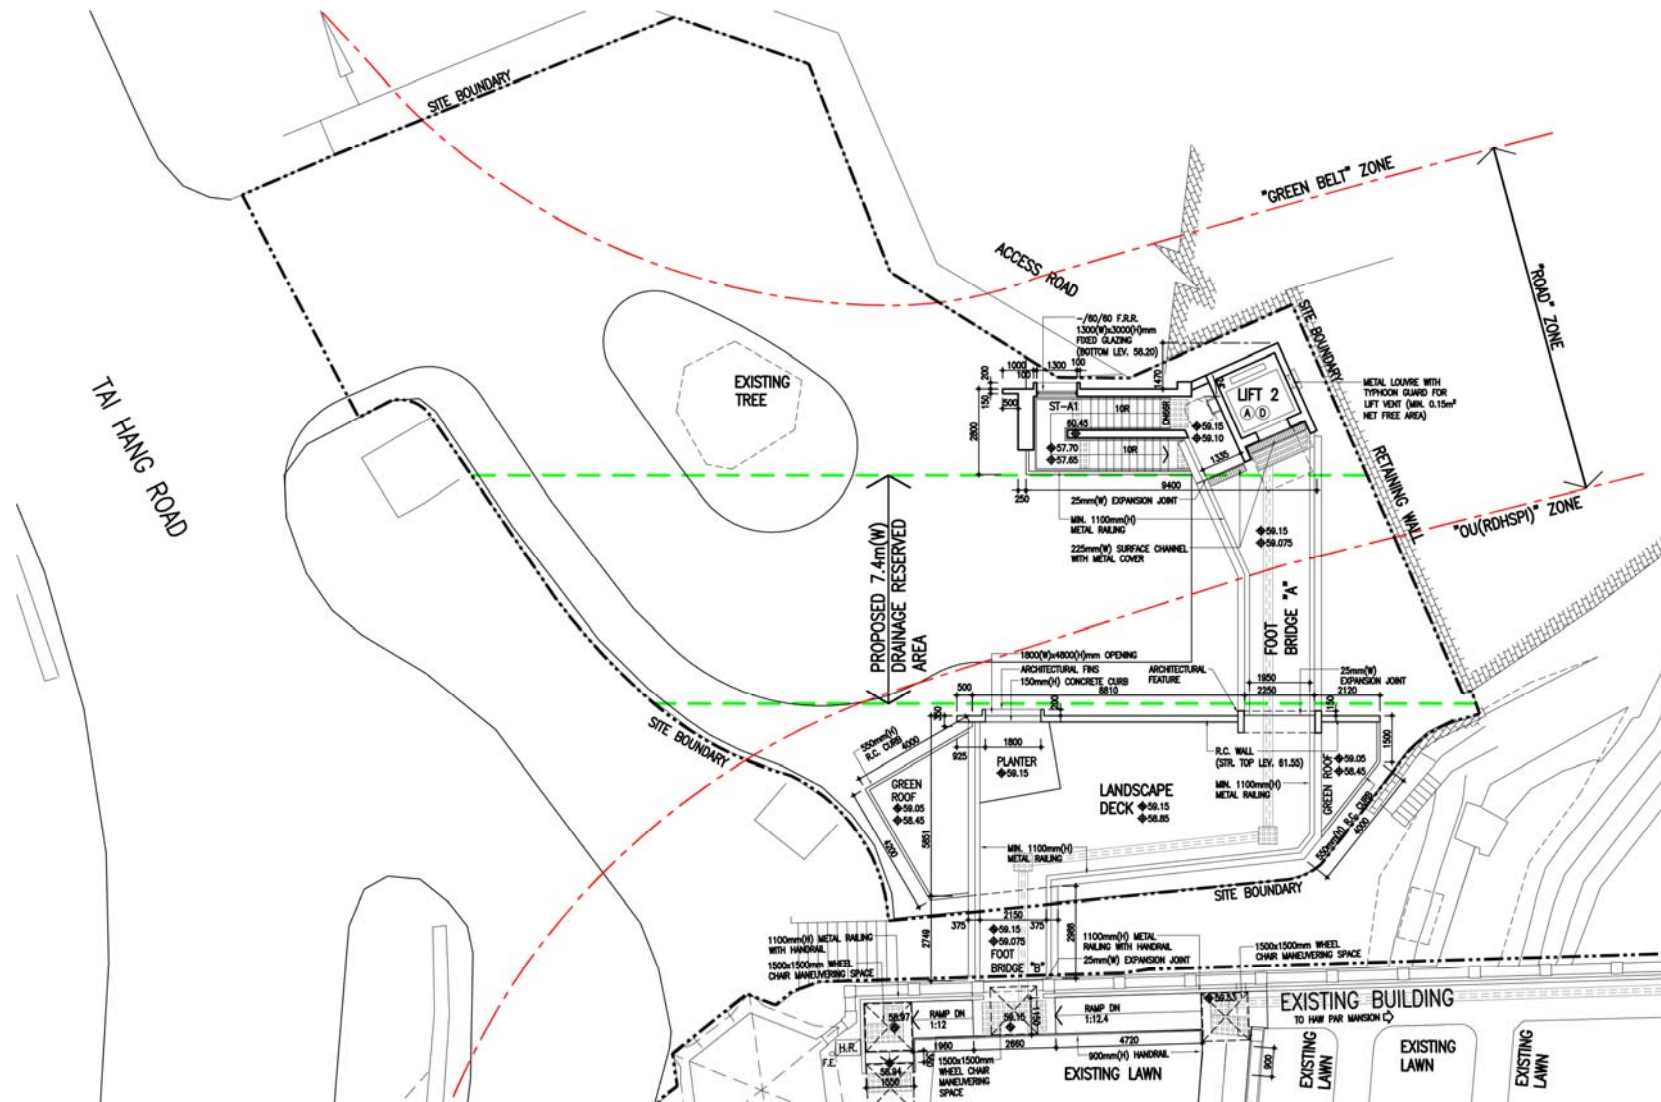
Proposed First Floor Plan of the Ancillary Site (not to scale)
